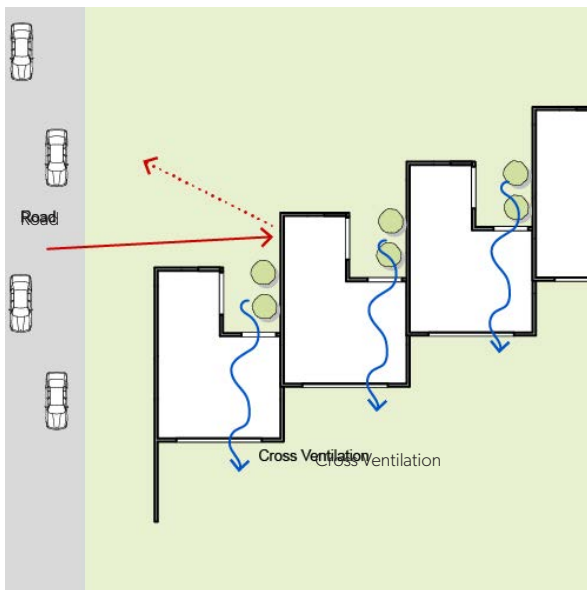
Staggered terrace houses can be arranged to shield windows from excessive traffic noise and still allow for cross ventilation
